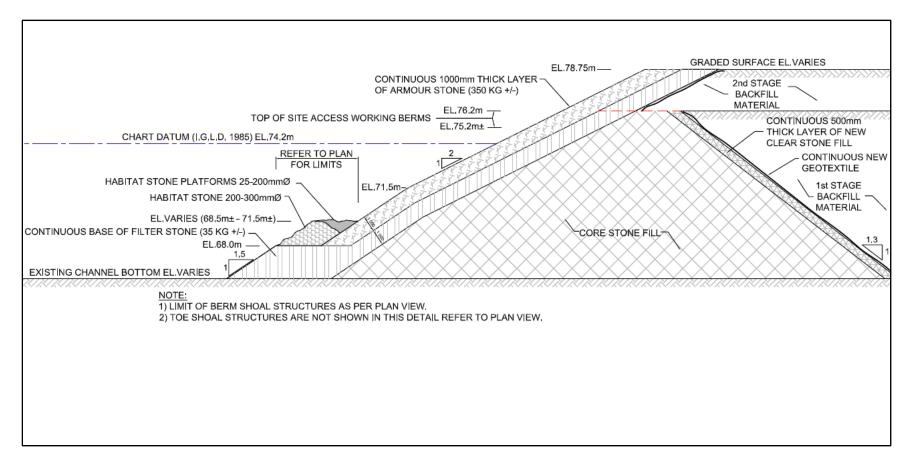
Typical Berm Shoal Section on Confinement Berm
